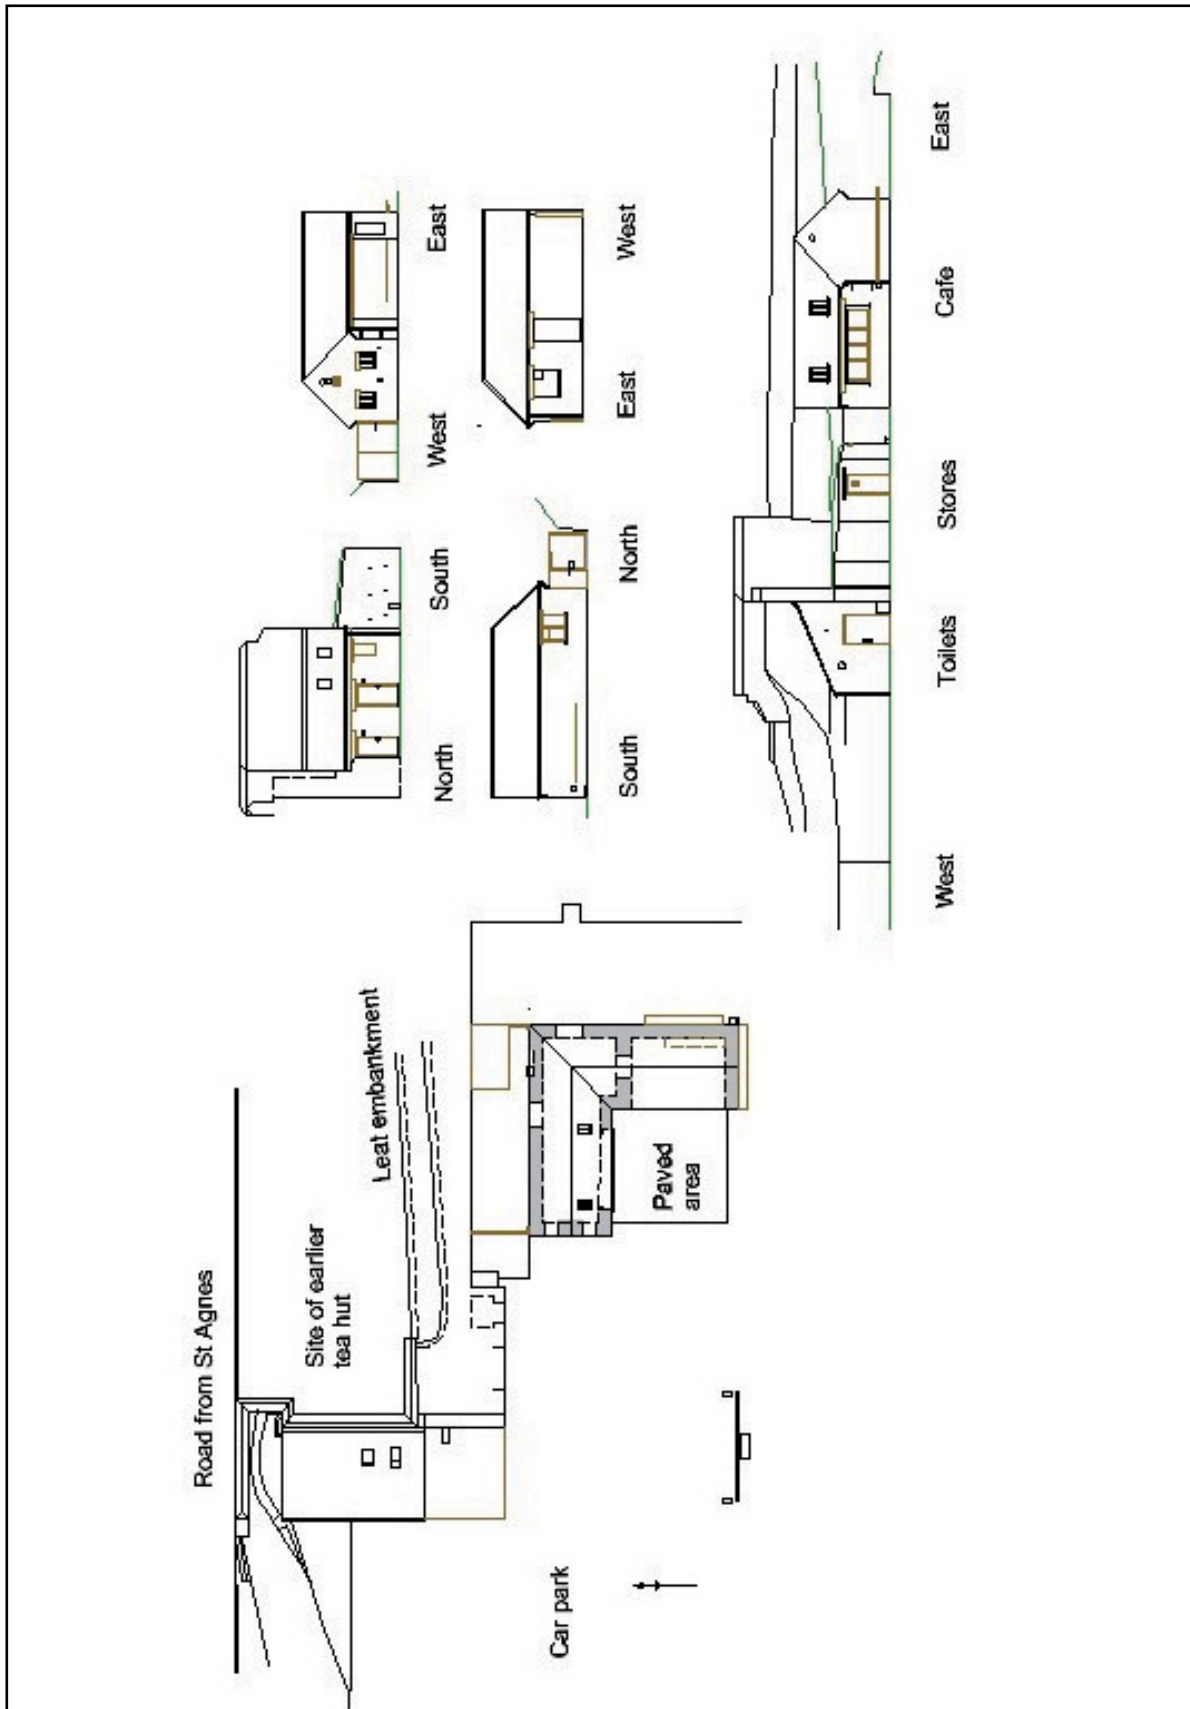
Plan and elevations of features in Chapel Porth car park, including café [190500] and toilet block [190495].
